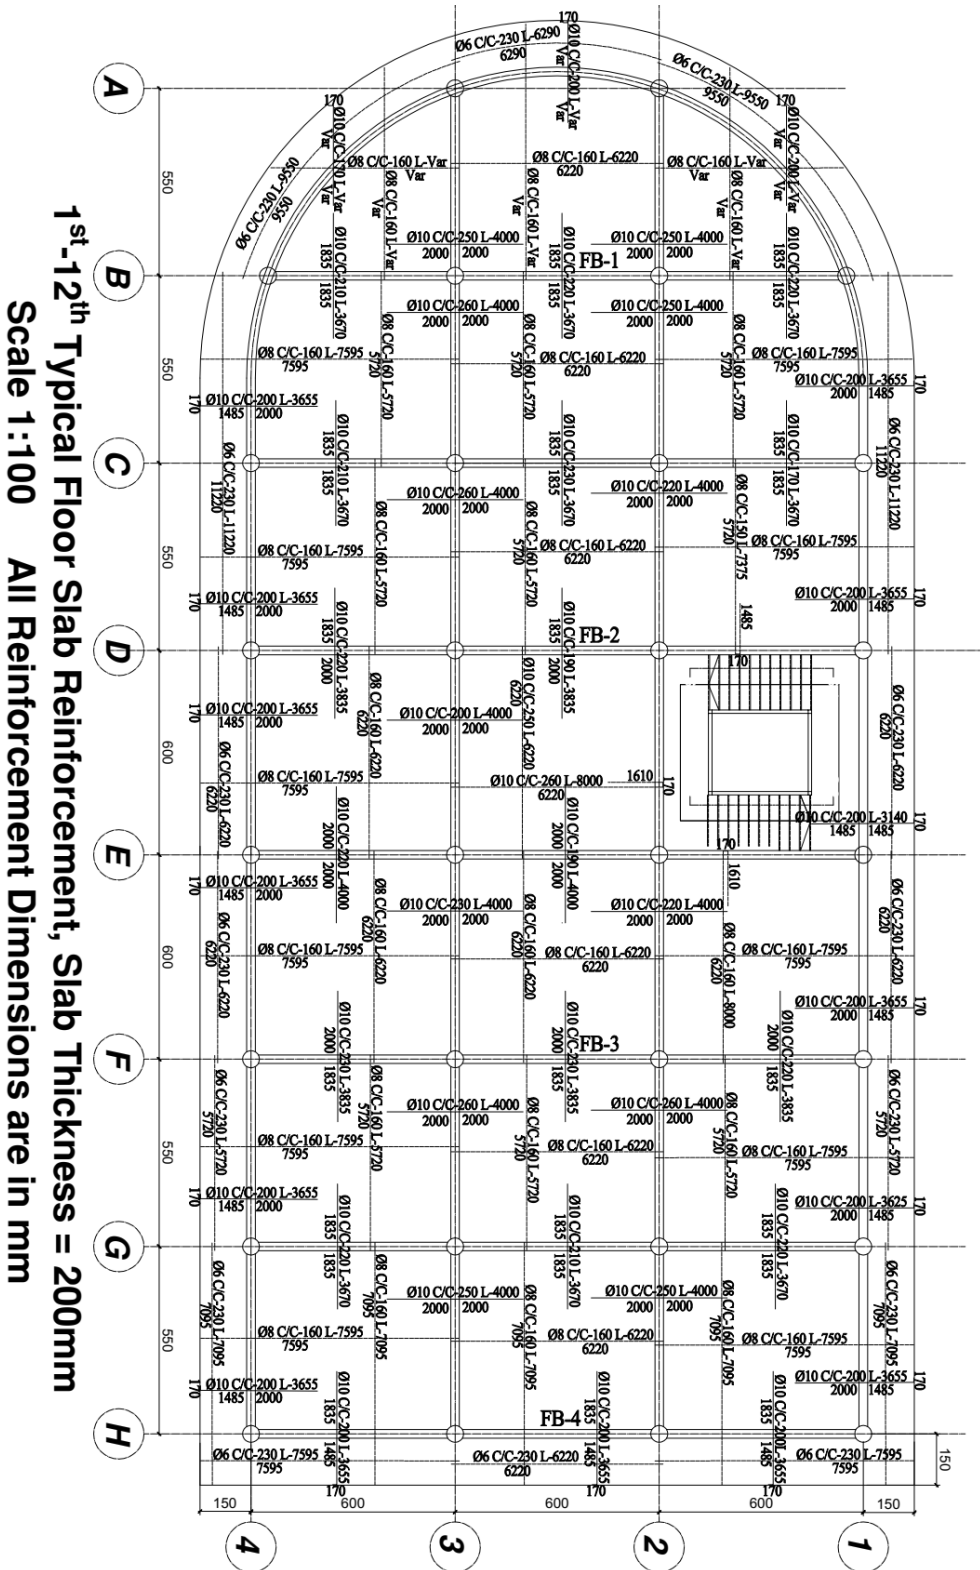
Sample slab detailing for G+12 building with C-25 concrete
